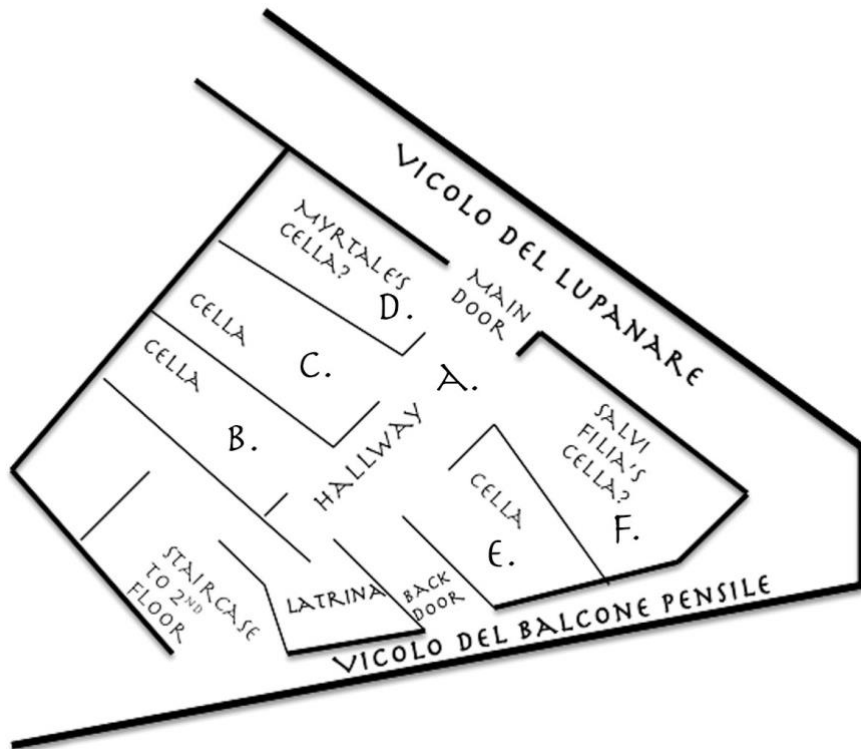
Floor plan of the Lupanar. [Underlying plan after Strong, 2016, 149]
